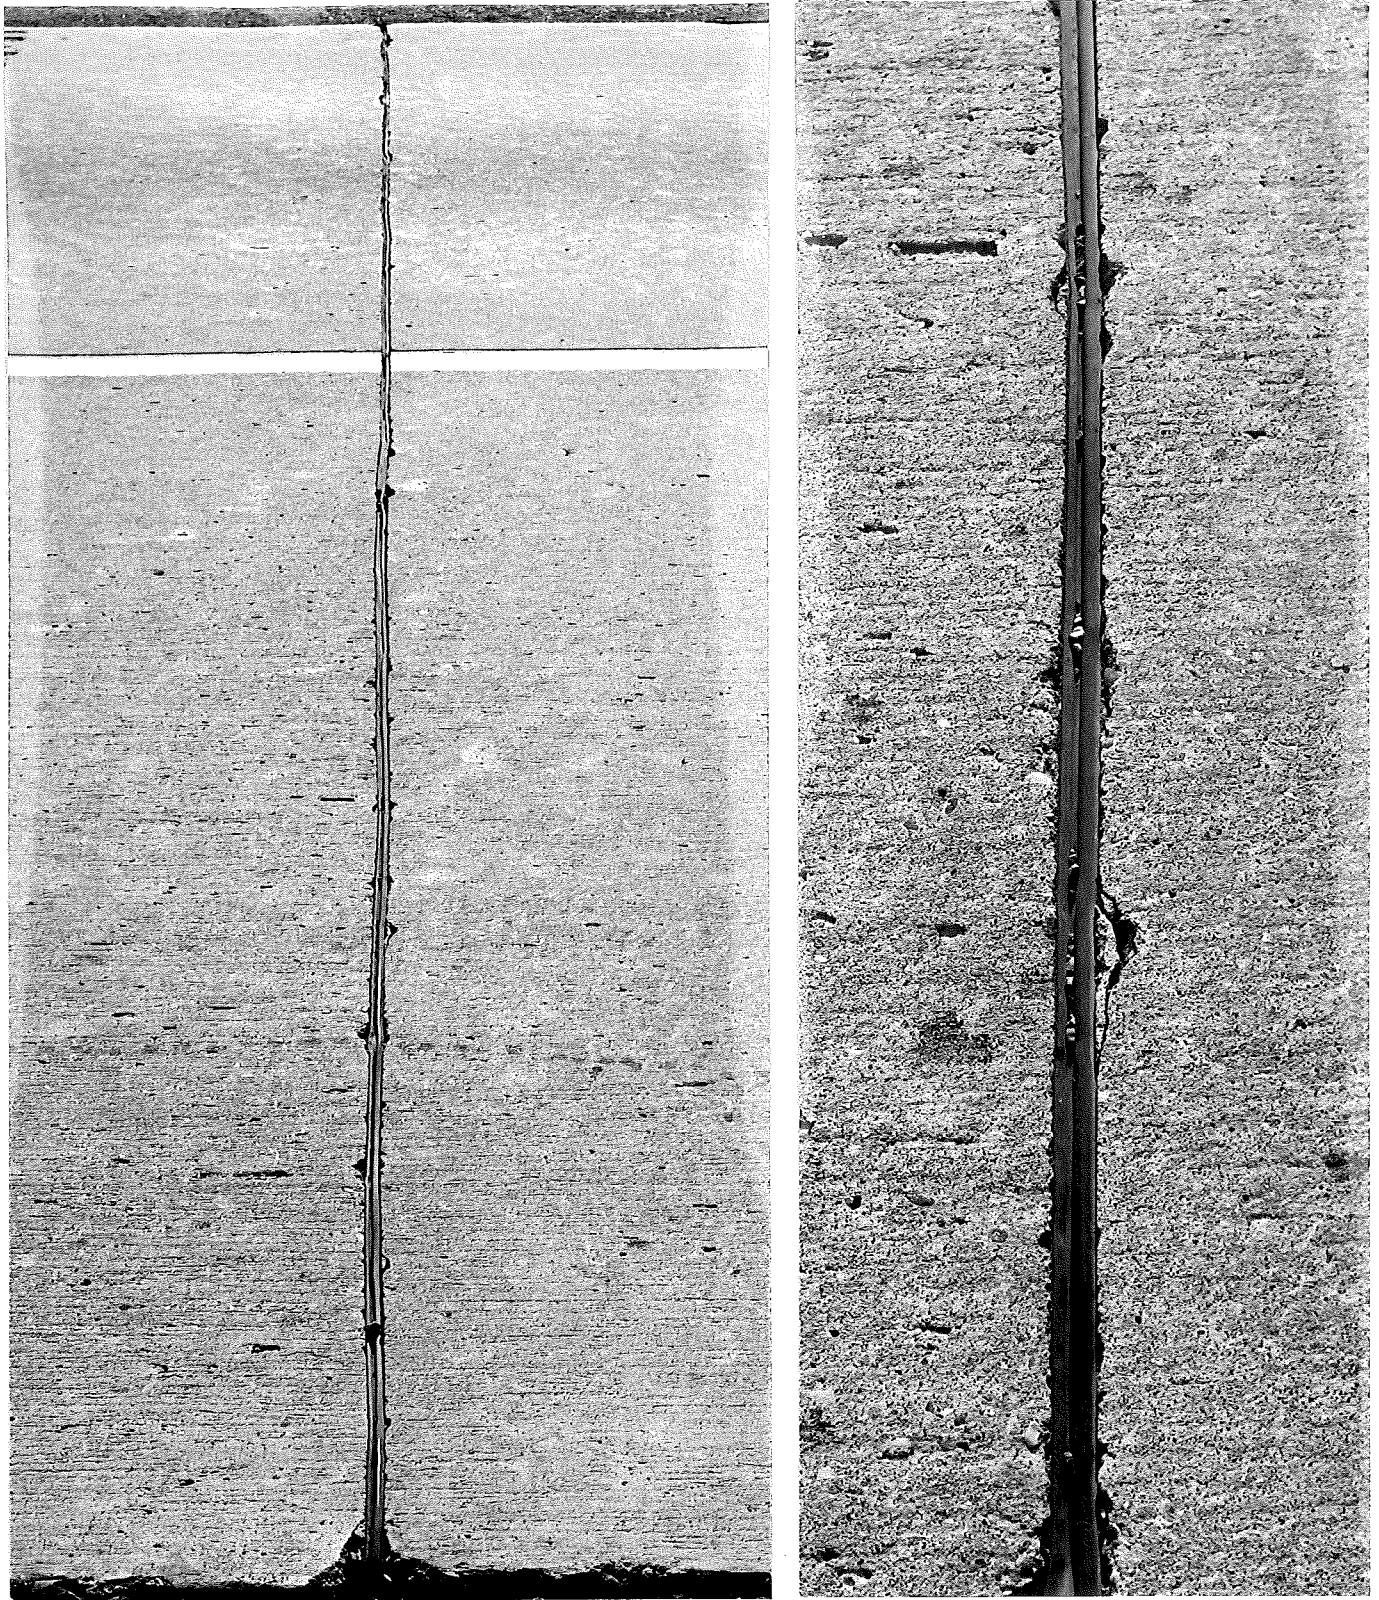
General view and close-up in center of passing lane, showing unusual amount of spalling and preformed neoprene sealer in joint formed with 1/2-in. styrofoam filler (Sta. 633+95 EB, photo: 11-5-64).
